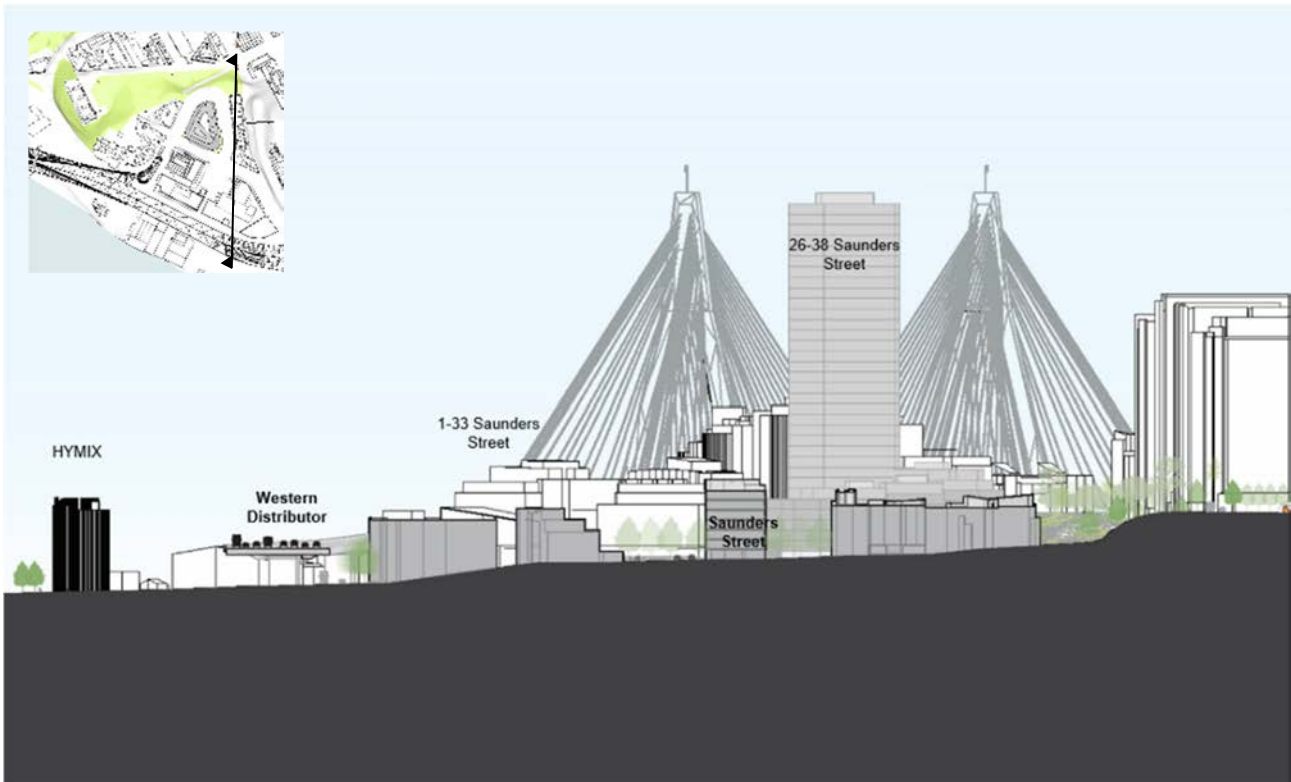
cross section looking west showing 26-38 Saunders St envelope as exhibited late 2024
